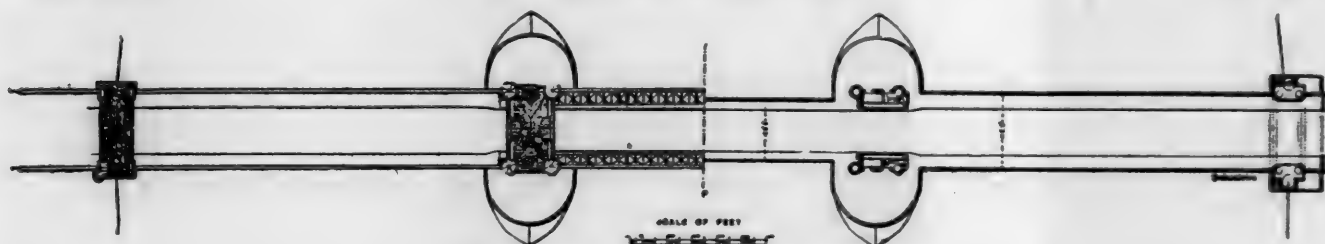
SEMI PLANS OF BRIDGE AT TOP AND ROAD LEVEL
